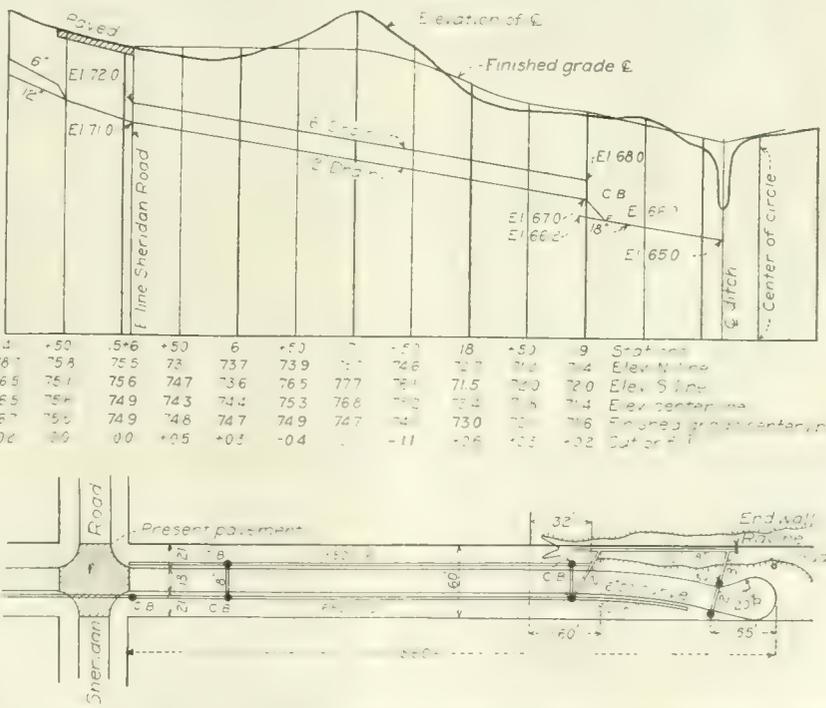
Portion of Plans Showing Type of Data Placed on Construction Drawings.
